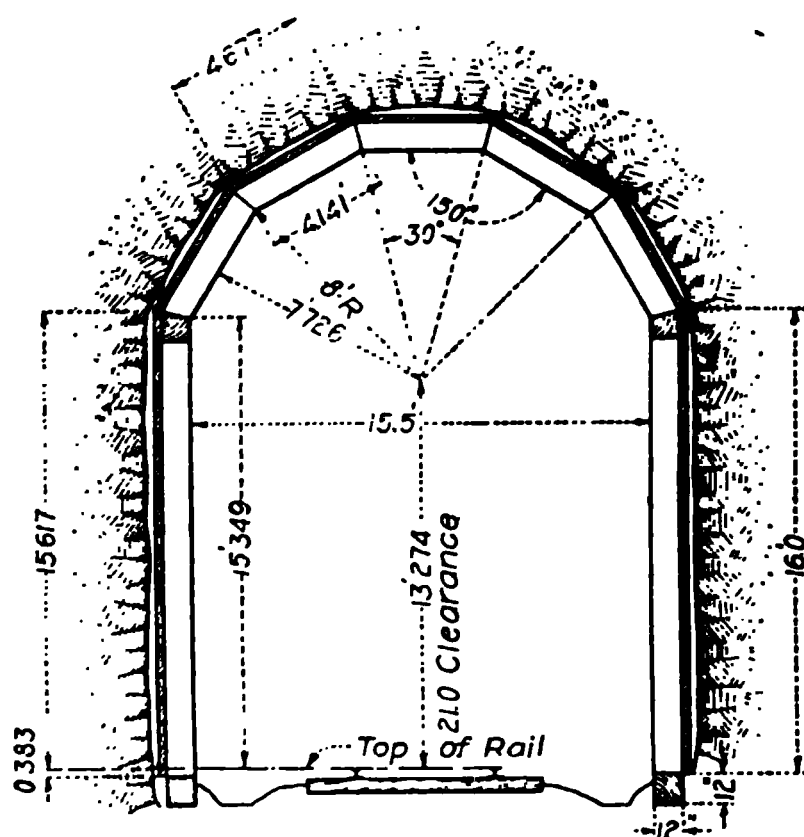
Section of tunnel and timber lining, in any way connected with the tunnel. It required 39
